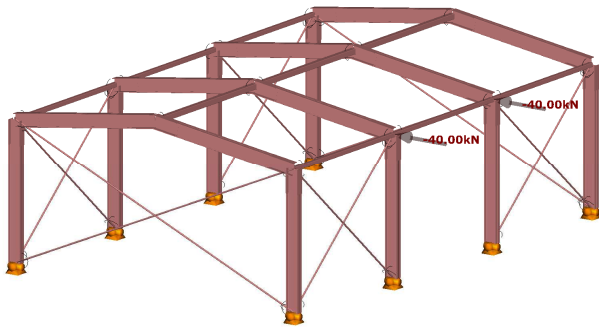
Consteel model of plain structure, showing the applied load of 40 kN on the two intermediate frames.
